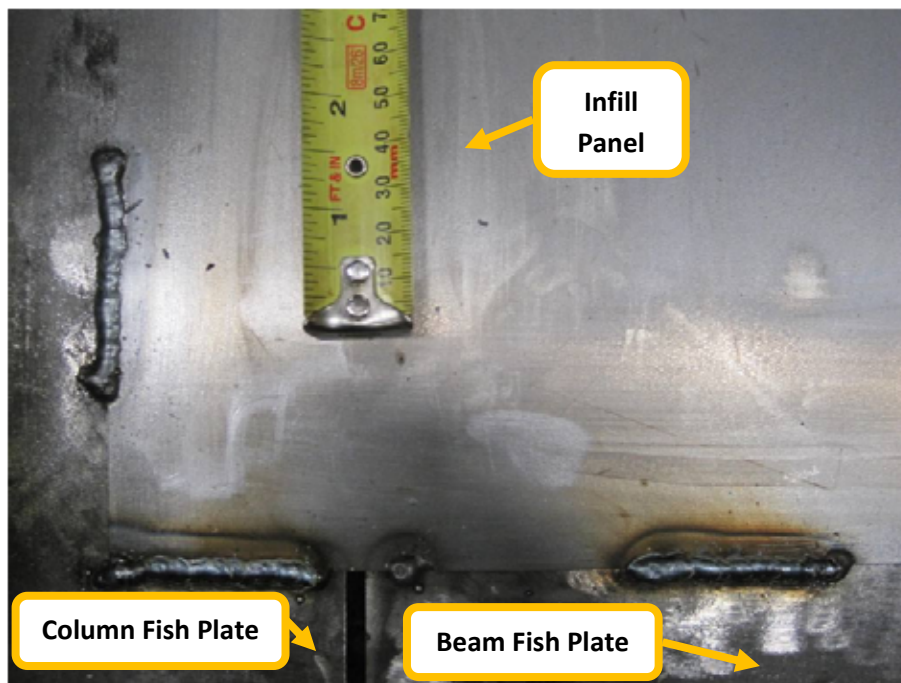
Typical Corner Detail Following the First Cycle of Stitch Welding
